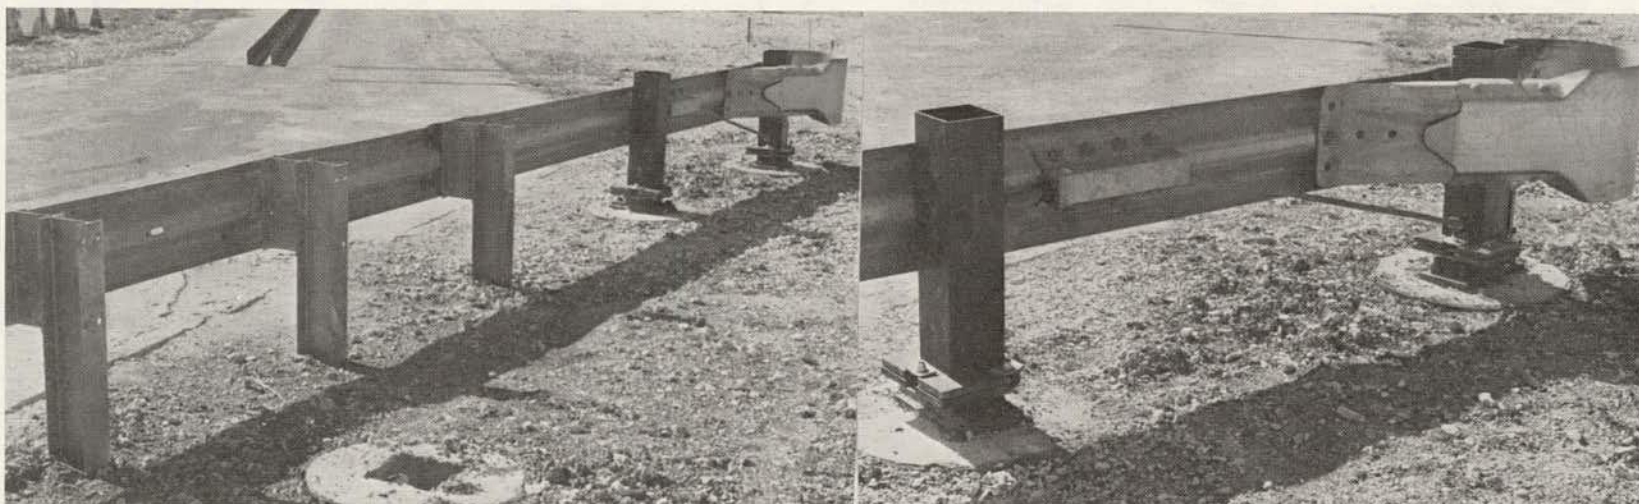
Guardrail BCT With Steel Slip Base Terminal Posts
